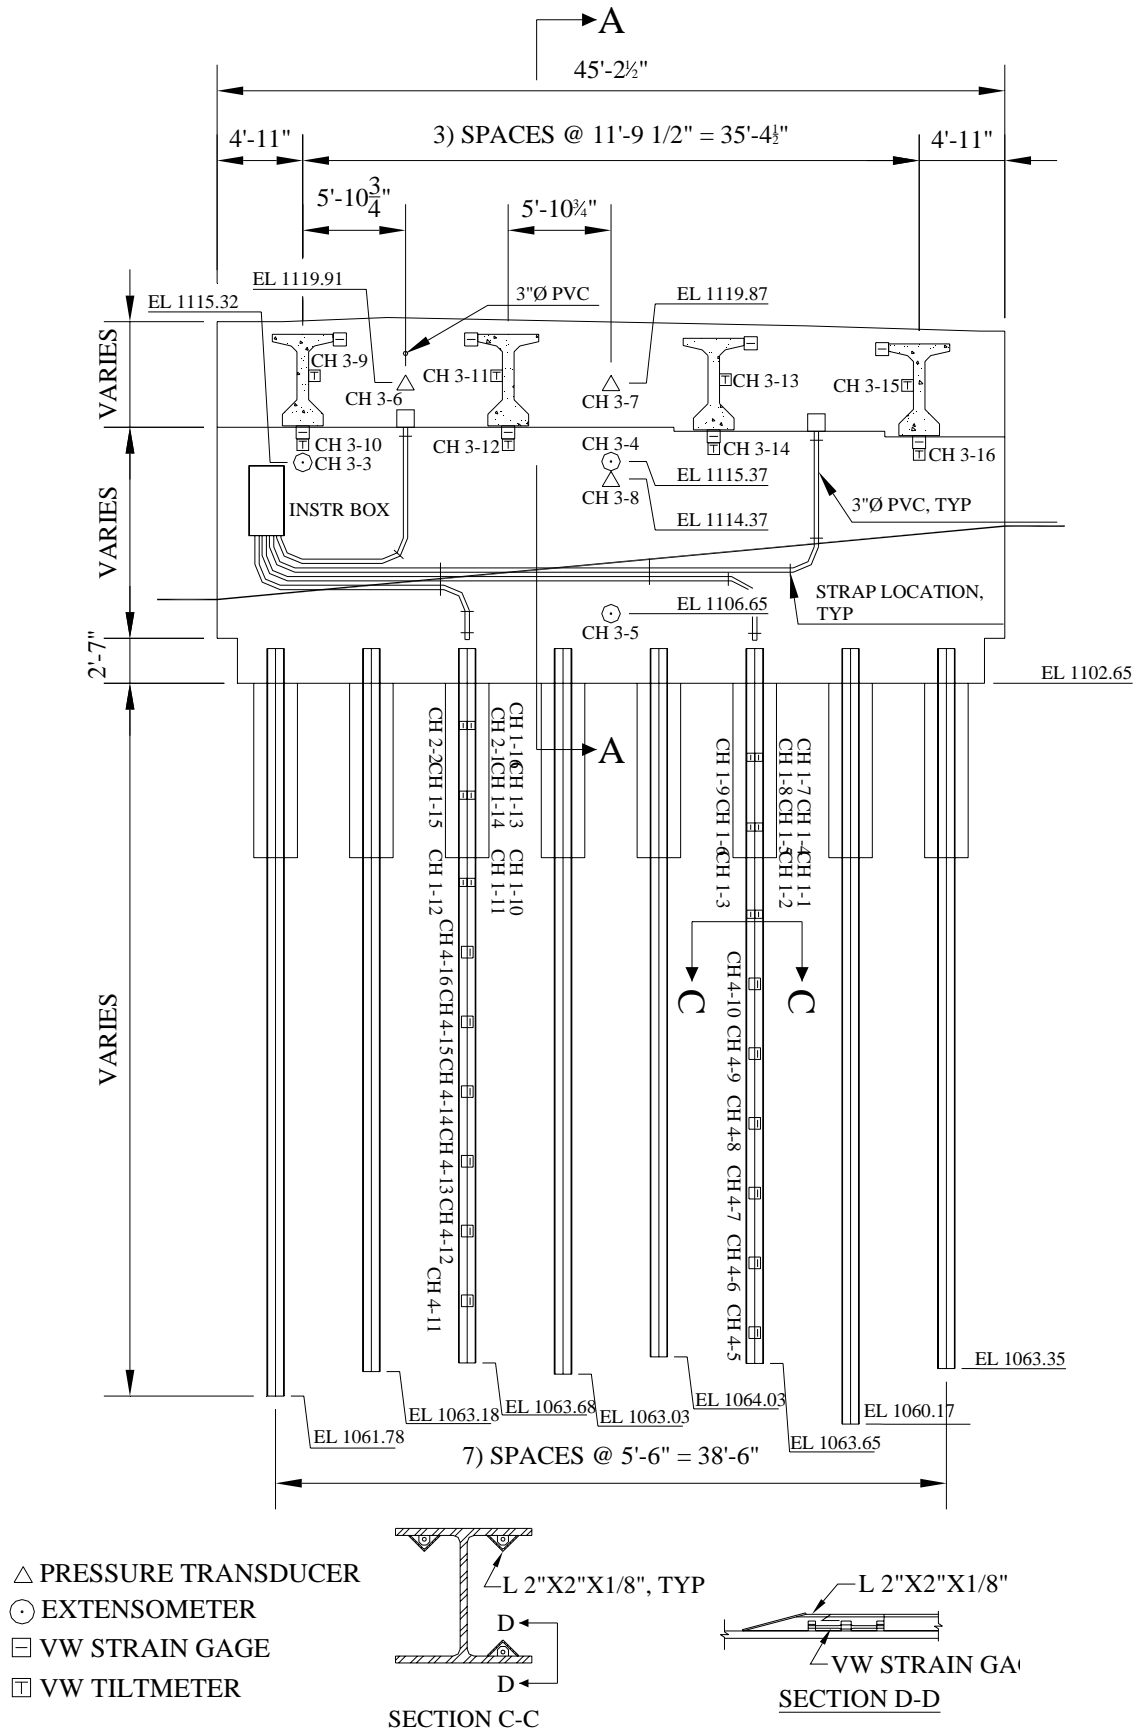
Structure 203 Abutment 2 Elevation (Section B-B).
